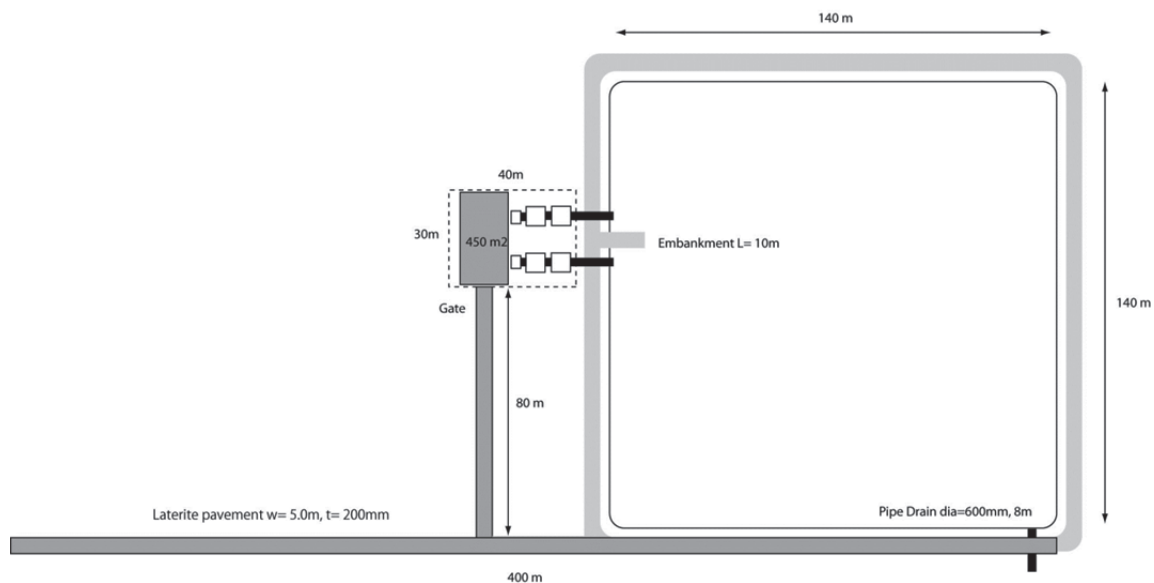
Layout of the treatment facility for the sludge from septic tanks
